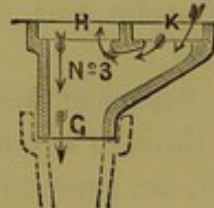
Section of "Connecting-piece" for Vertical Air Inlet to Vertical Soil-pipe.
